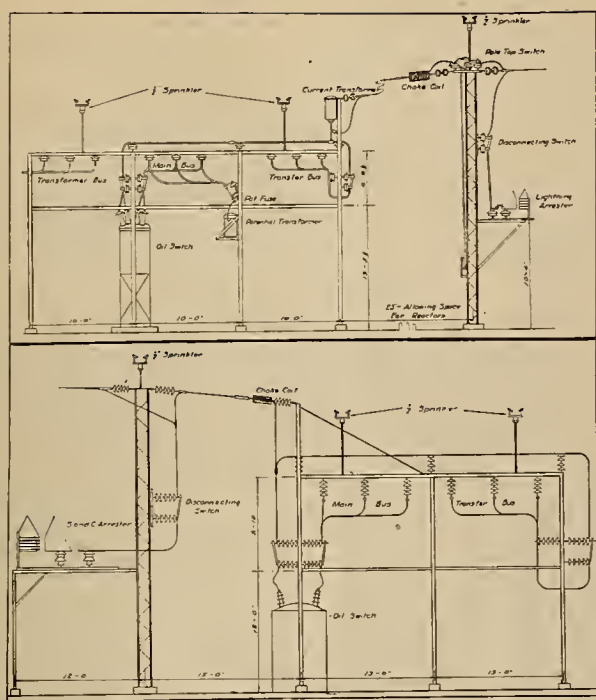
Section through 60-kv. rack (below) and through 15-kv. rack showing location of sprinklers and other arrangements, Anita substation.
